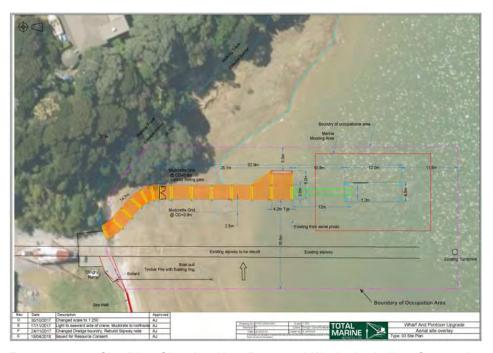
Site Plan Showing New Proposed Works Including Occupation Area
